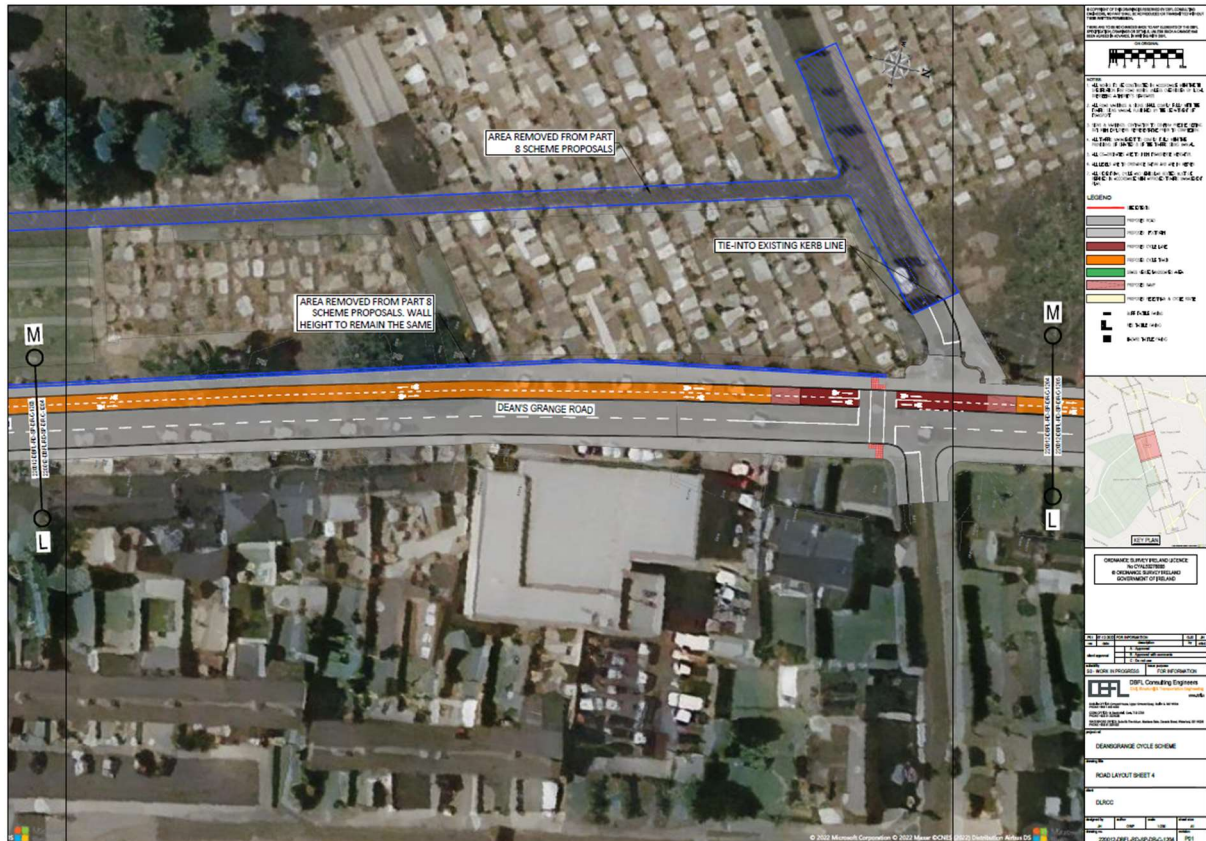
Outline design and layout of proposed scheme- Section 4 (source: DBFL Consulting Engineers)
